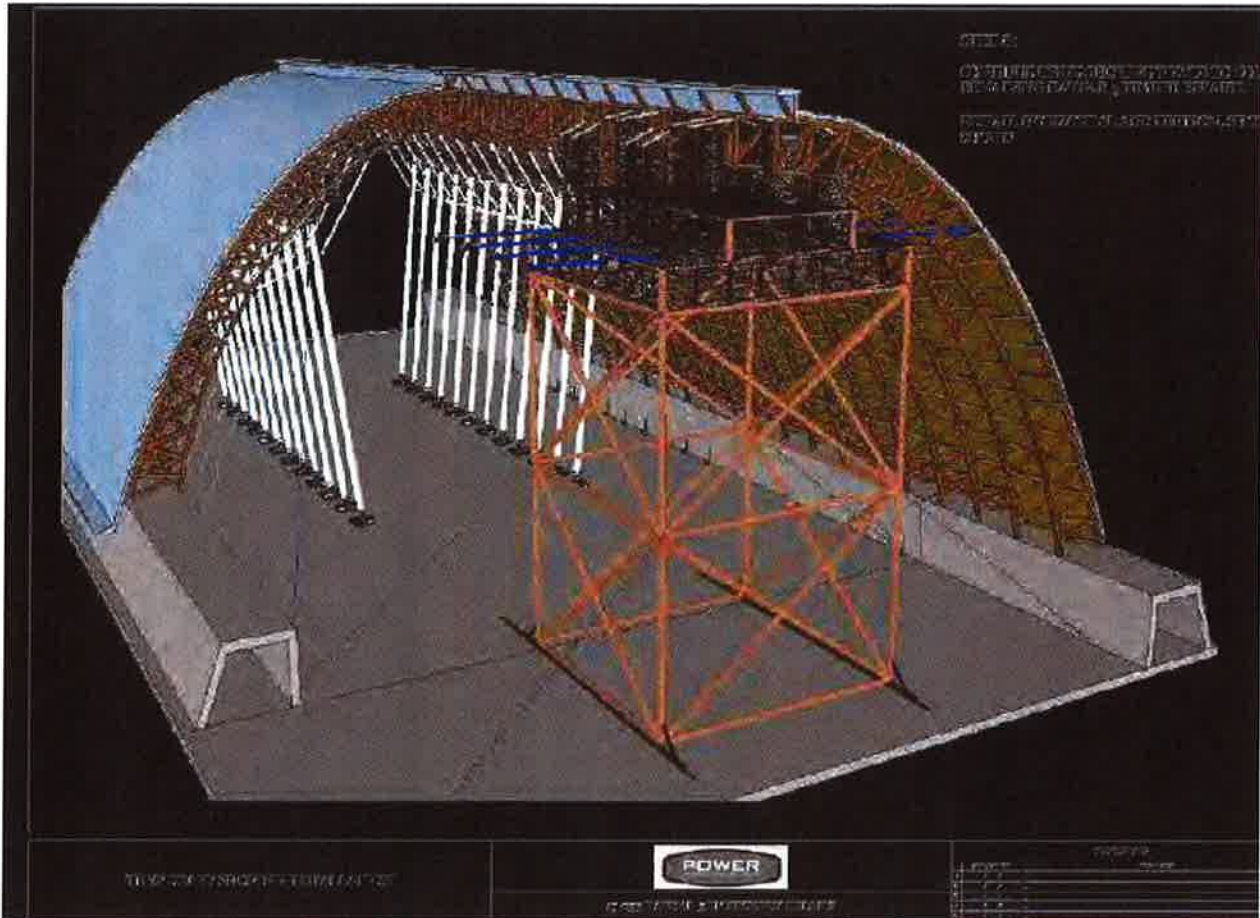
Isometric of Temporary Shoring & Shoring Tower
